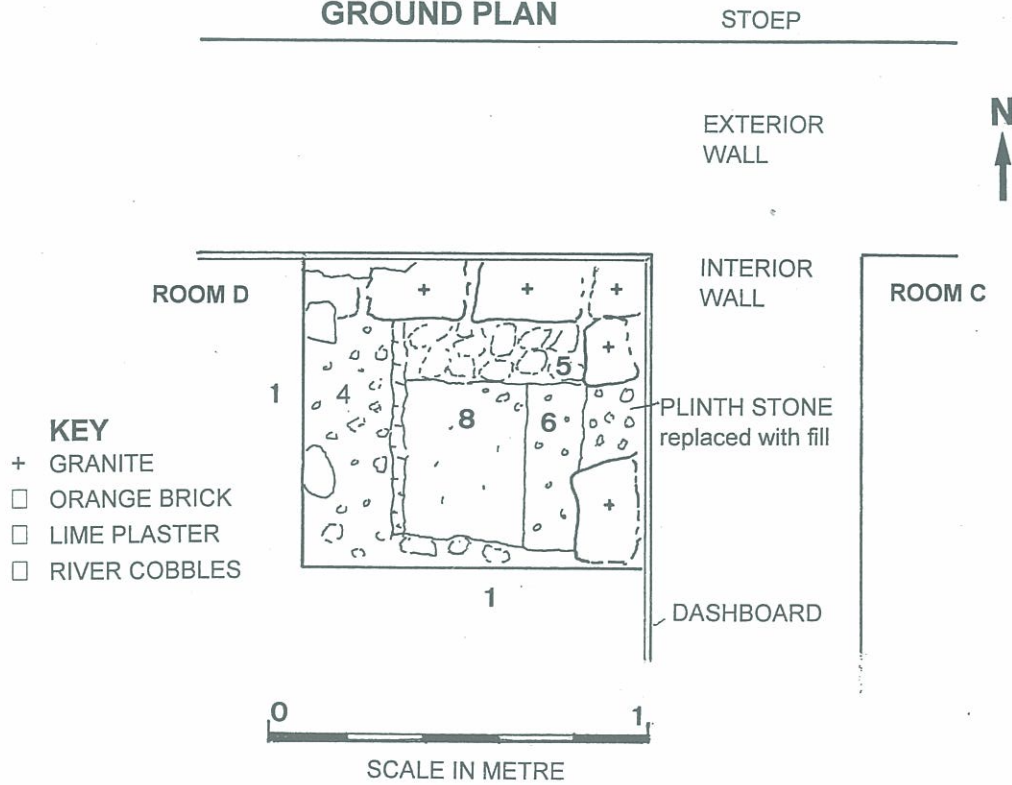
Ground plan of corner section D1/2 in Room D. Note the similar wide stone plinths as in Room B, for boarded floors. There was no gravel or sand fill of the post-1940s.
